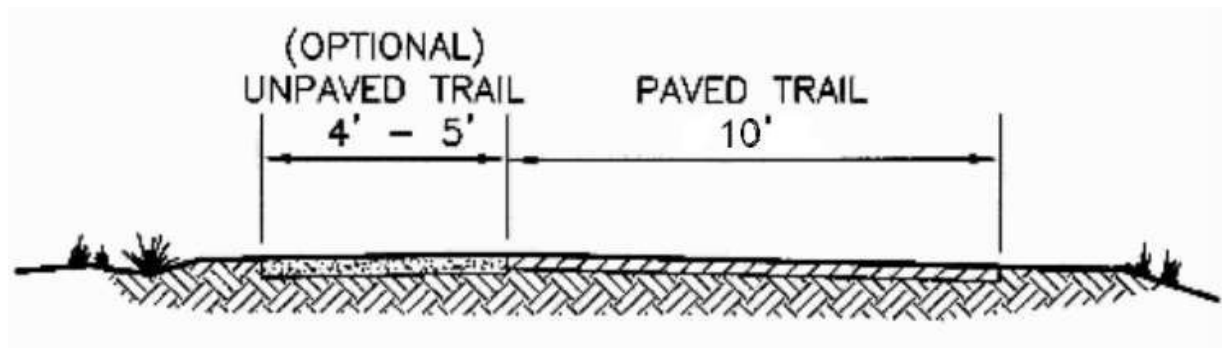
Typical Paved Multi-Use Trail Cross Section (no separation)
